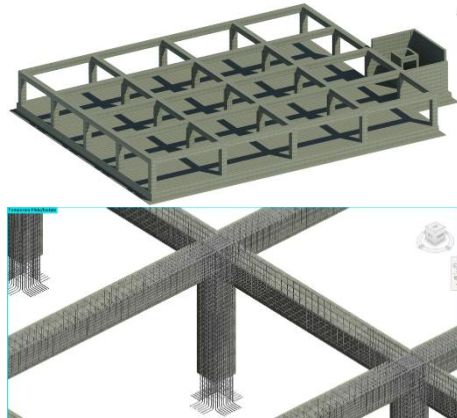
Reinforced Concrete Structural System and Column & Beam Reinforcement Modeling.
